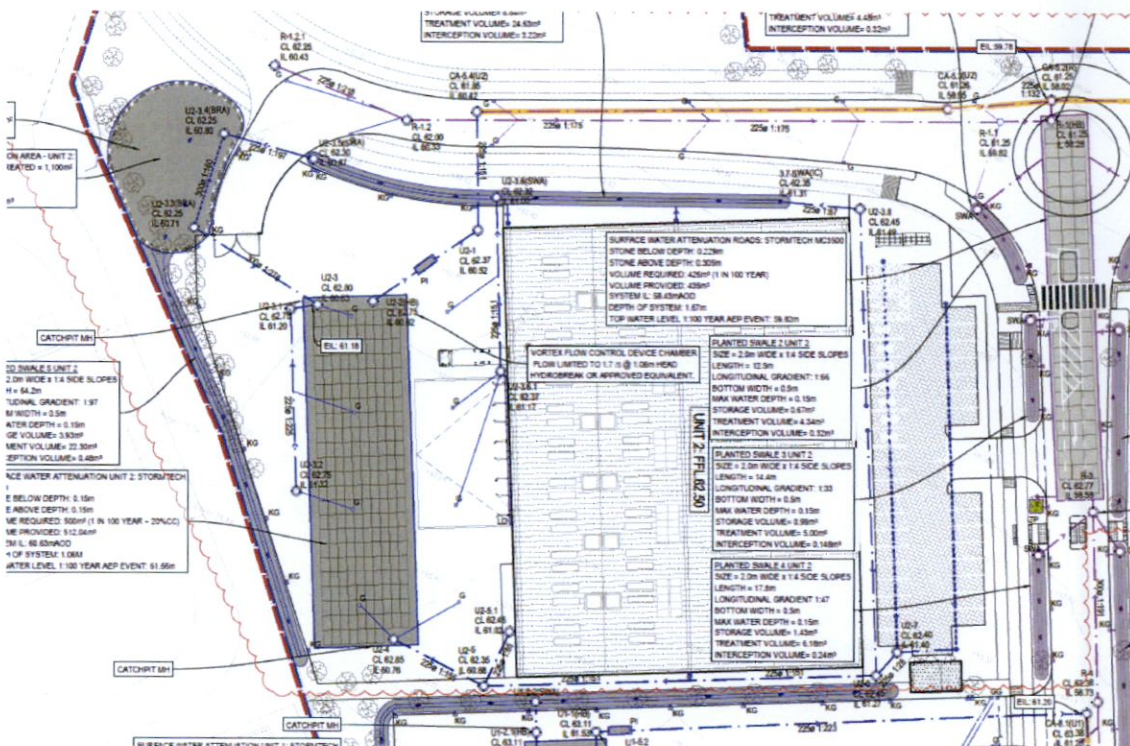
Excerpt from revised surface water layout plan, 210175-DBFL-SW-SP-DR-C-1300
